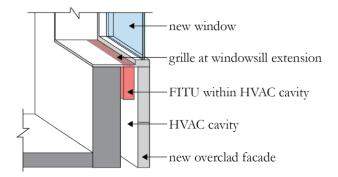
Perimeter wall section showing the FITU location within the façade cavity and the windowsill grille.
